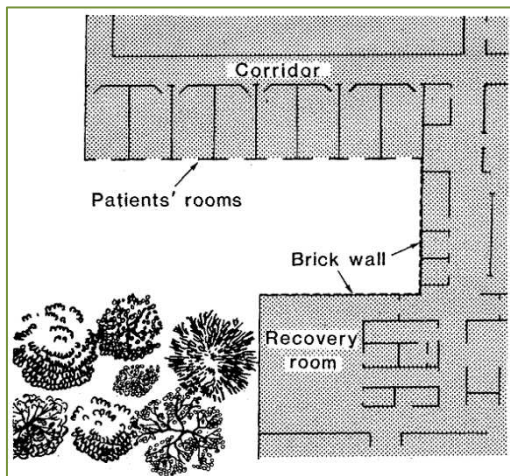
Plan of the second floor of the study hospital showing the trees versus wall window views of patients. Data were also collected for patients assigned to third-floor rooms. One room on each floor was excluded because portions of both the trees and wall were visible from the windows. Architectural dimensions are not precisely to scale.
